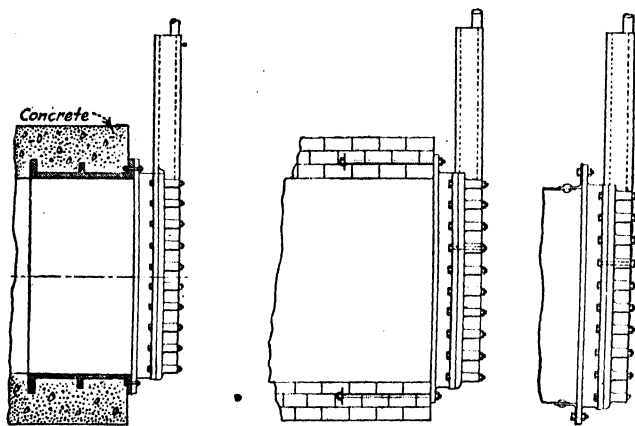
Methods of attaching sluice gates by flanges to wall castings, masonry and pipes.
